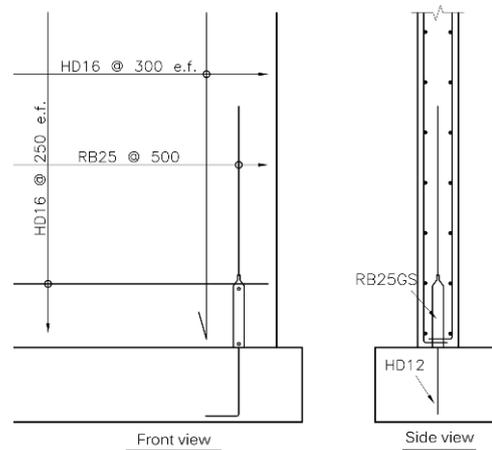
An example of a double layer reinforced panel with a grouted sleeve connection.
